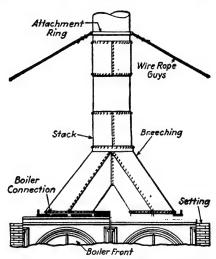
Showing the method of supporting a guyed steel chimney on the breeching of a boiler.
